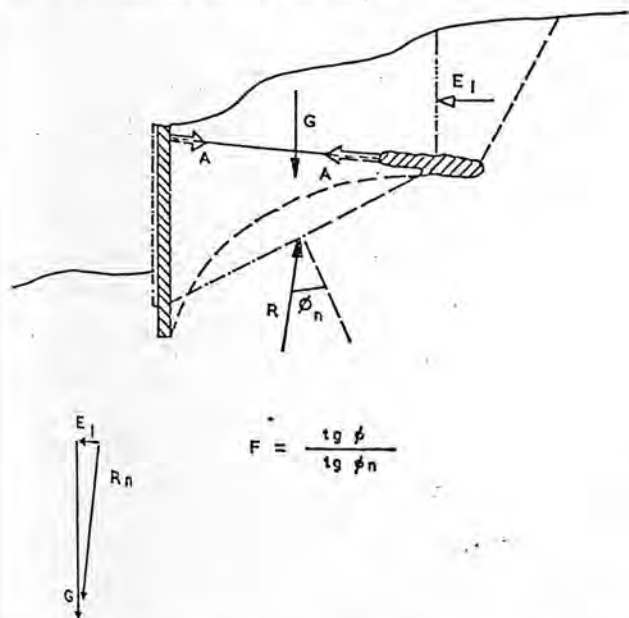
Stability of a wall with one row of anchors: modified Kranz Method.
